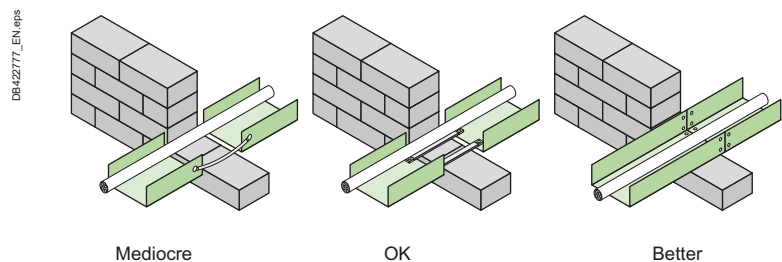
Recommendation for metal cableways assembly to pass through a wall
